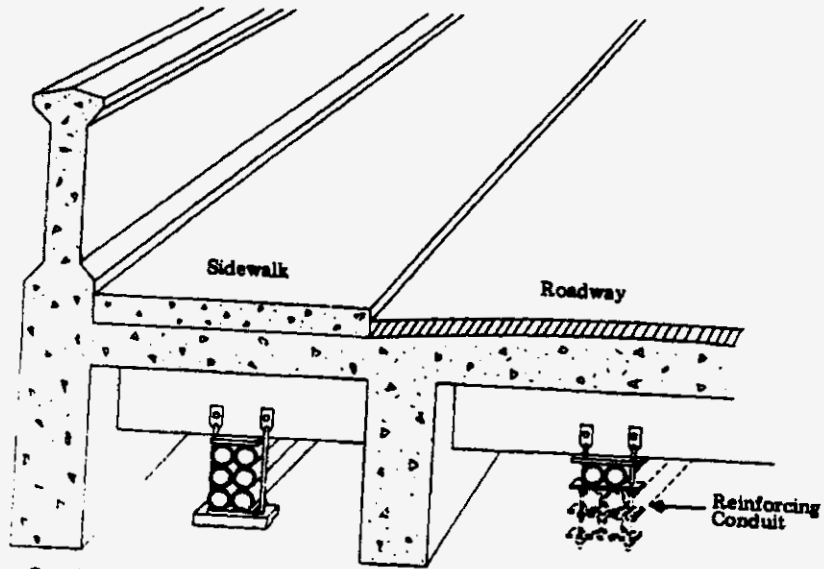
Conduit Installed by Hanging Under Sidewalk and Roadway Portion of Bridge with Reinforcing Conduit Mounted Under Roadway Portion of Conduit.
